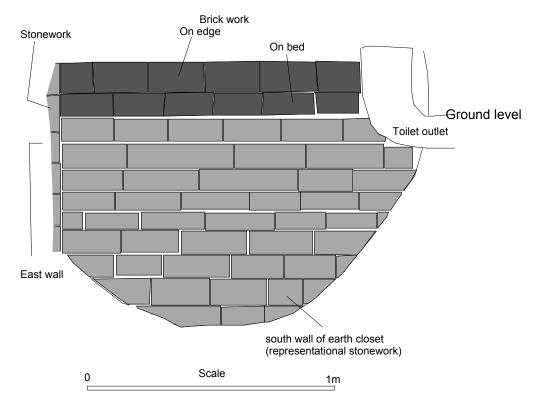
North facing section of earth closet, showing stonework under toilet floor.
